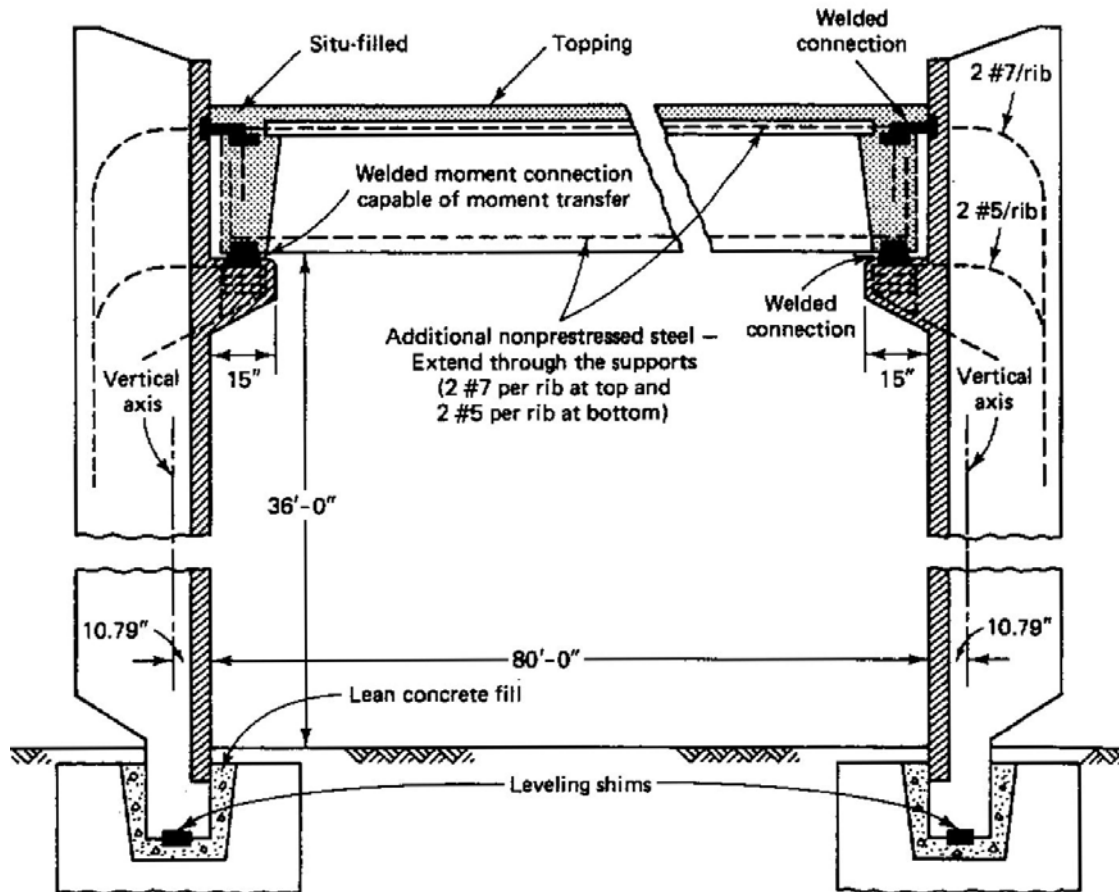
Sectional elevation and connection details of frame in Example 6.7.
